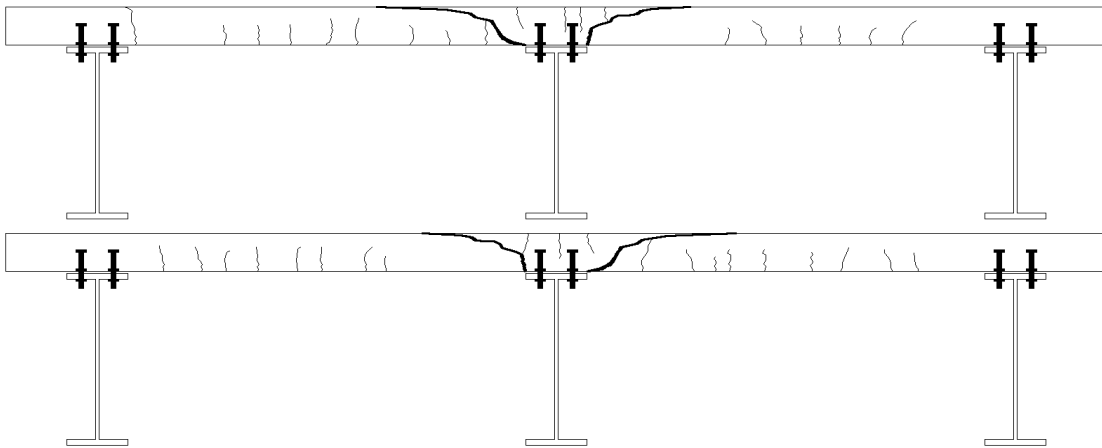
Crack mapping of bridge deck Prototype 6.
